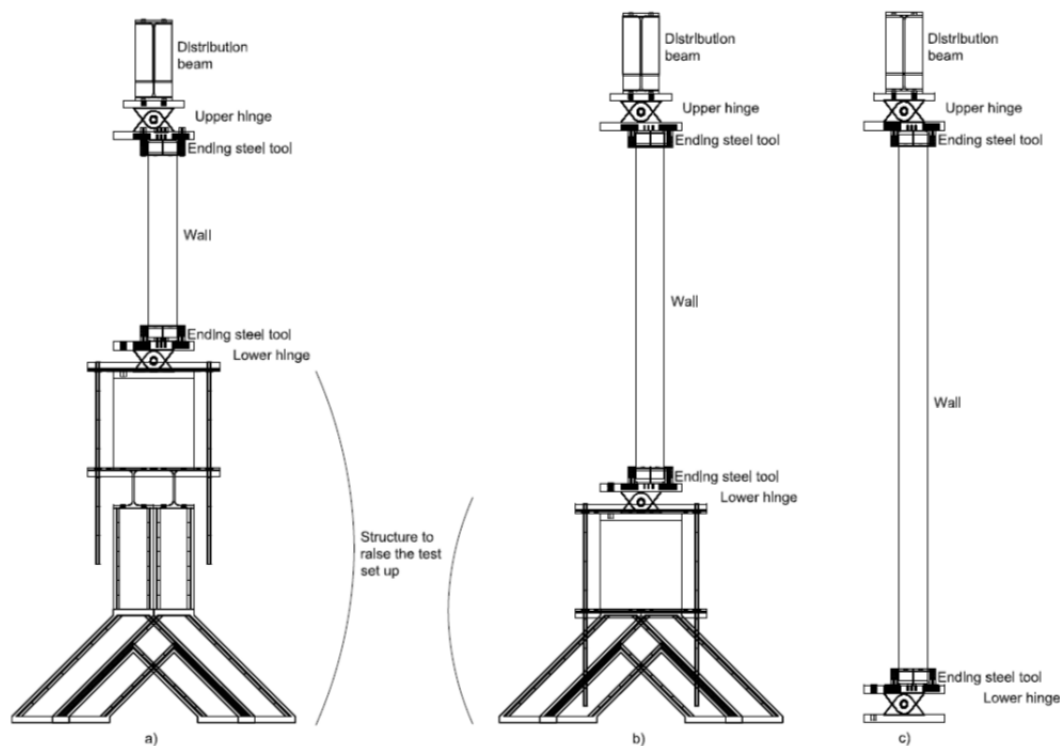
Test setup a) for walls from series S, b) for walls from series M and T and c) for walls from series H
